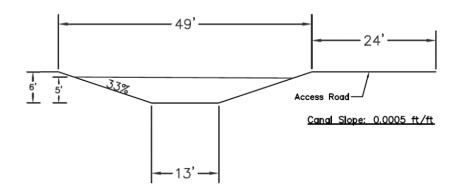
Bypass Canal Cross Section – 500 cfs Capacity
